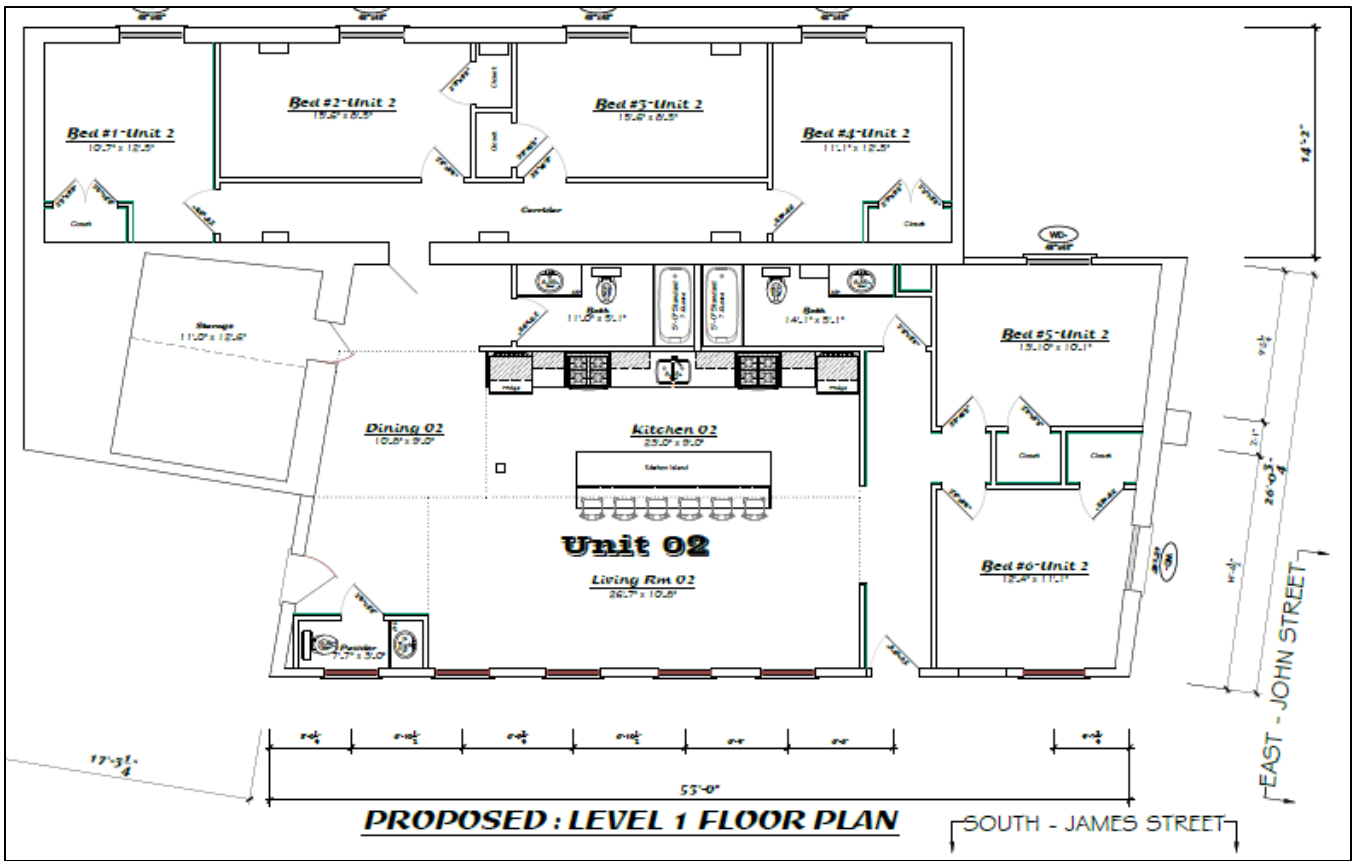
Floor Plan, First Floor (Source: Annable Designs)
